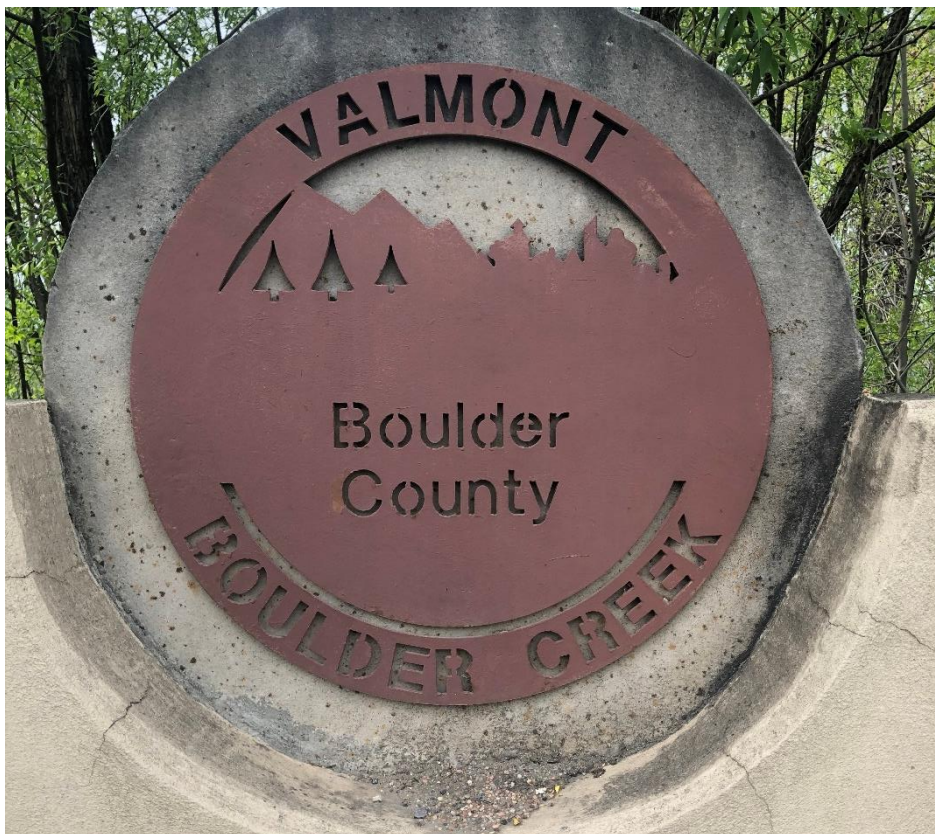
Photo of one of four (4) 28-inch medallions on bridge over Boulder Creek
